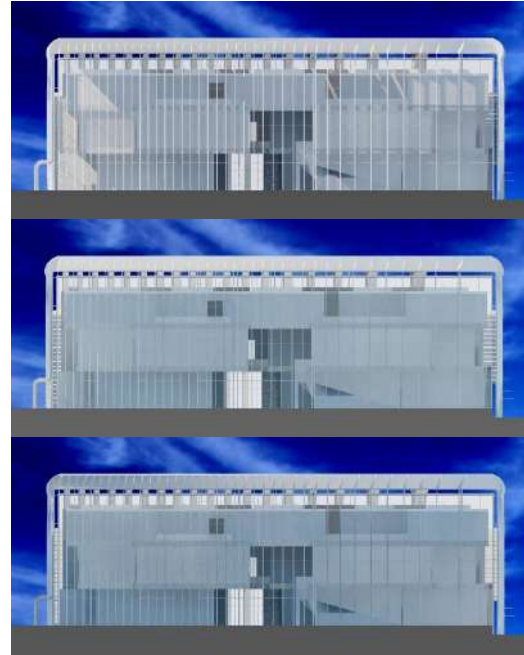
June 21, North elevations, 9 AM, 12 PM, and 3 PM (Personal Rendering)
